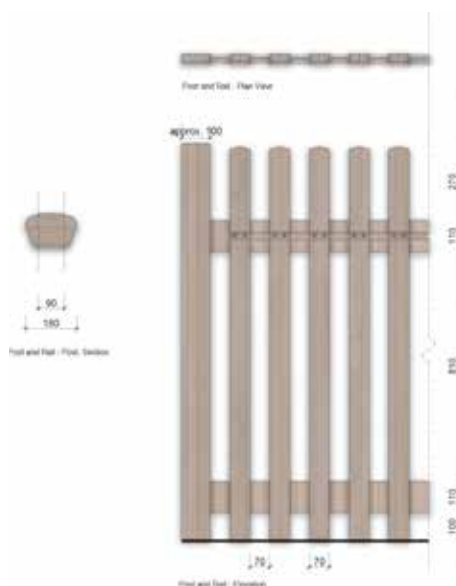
Timber picket fence detail redrawn from hand sketch provided by Francine Gilfedder
